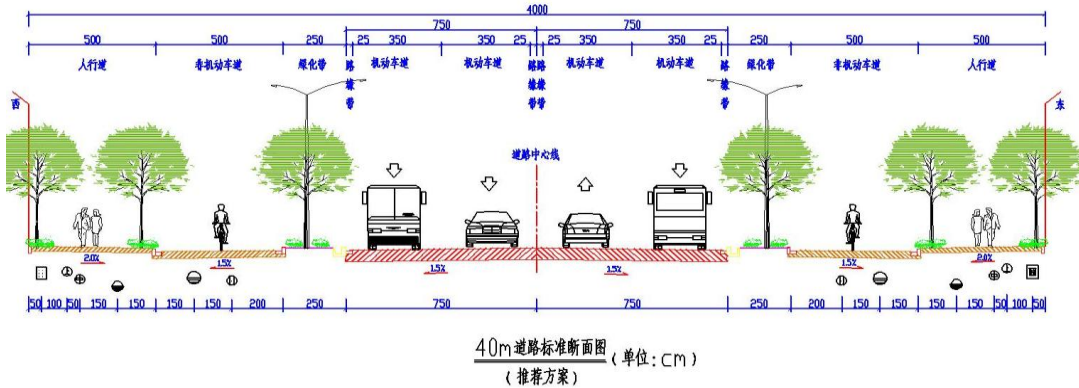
Cross-sections of Zhuluji Avenue in Lufeng 3
